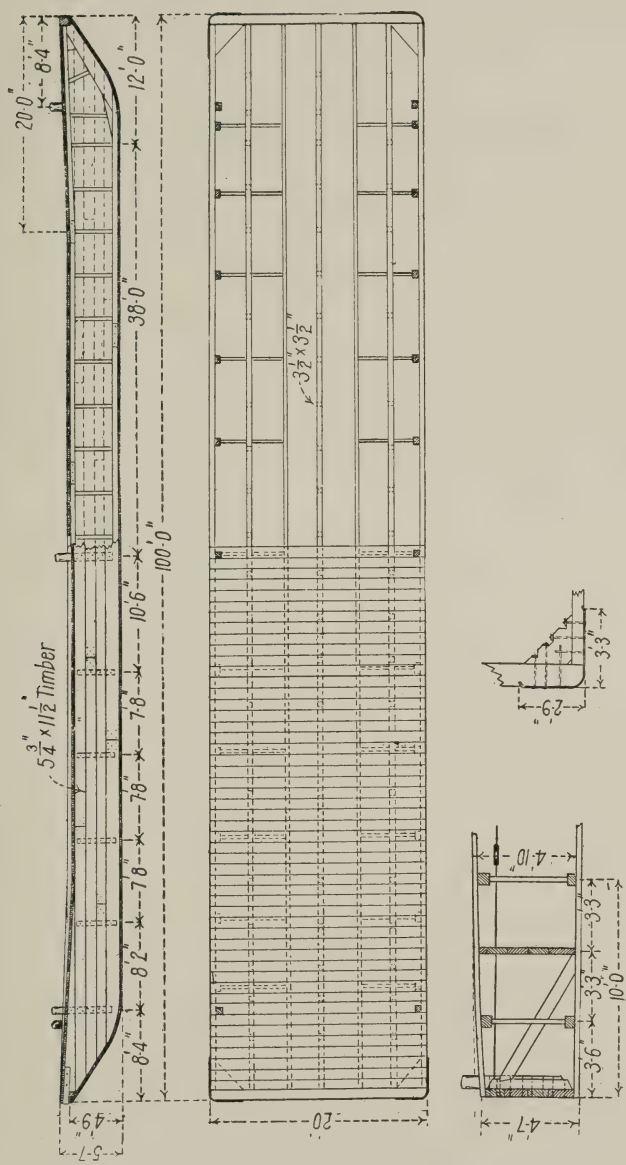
Plans for standard 100-foot barge for rock and brush.
